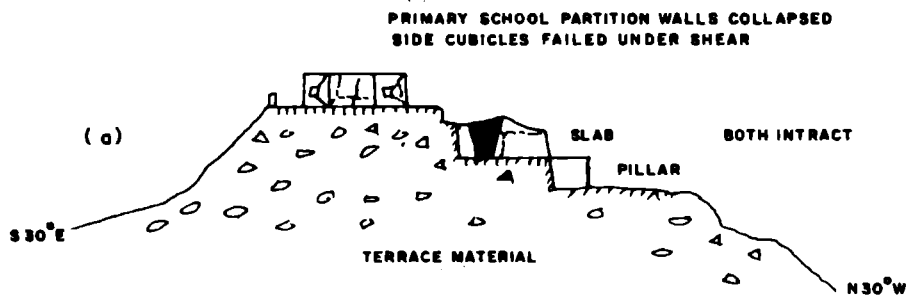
SKETCH SECTION OF THE NOSE ON WHICH BAINGA VILLAGE IS LOCATED. (a) COLLAPSED PORTION OF THE NE-SW ALIGNED HOUSE BUILT IN MUD MORTAR AND STONE (SHALE) PACKING, LIVES LOST IN THIS COLLAPSE.
